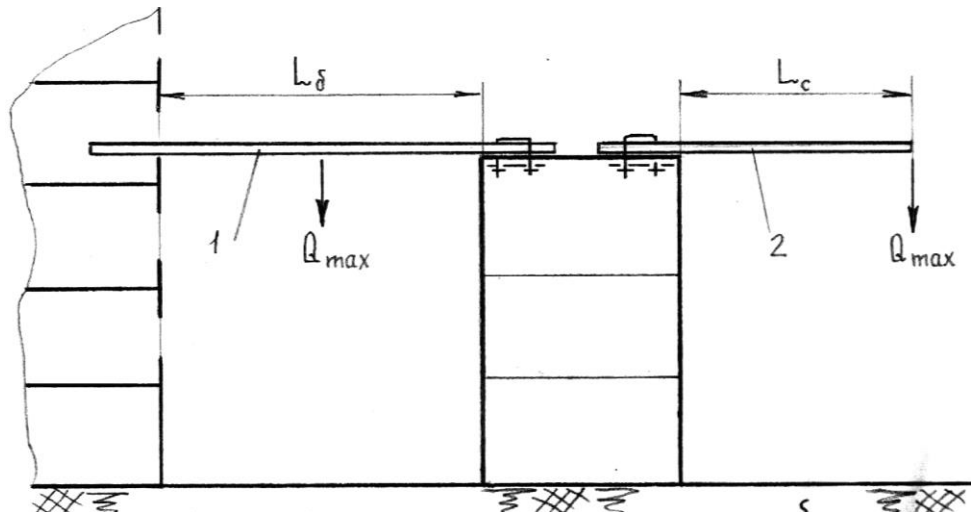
Layout of the mounting beam (a) and cantilever fixed boom (b): 1 – two-support beam; 2 – cantilever fixed boom.
